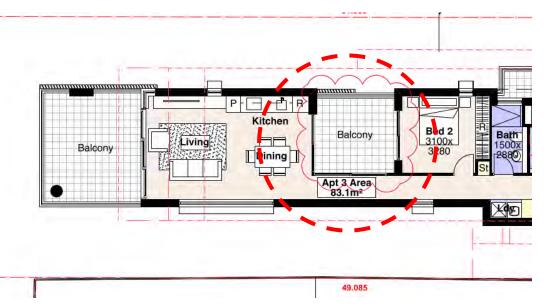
Typical plan of north facing balconies requested to be deleted within the deferral letter.
